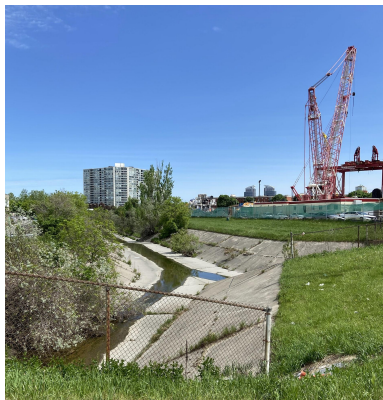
Concrete-lined drainage ditch located at the southeast corner of Nugget Ave and McCowan Rd with adjacent greenspace. (Photo by, Karen Khan)
